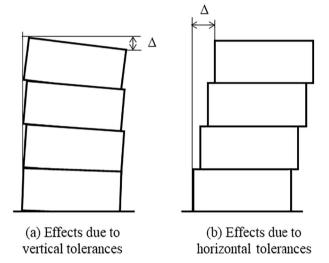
Positioning tolerances of modules causes accumulative error Δ during installation [11].
